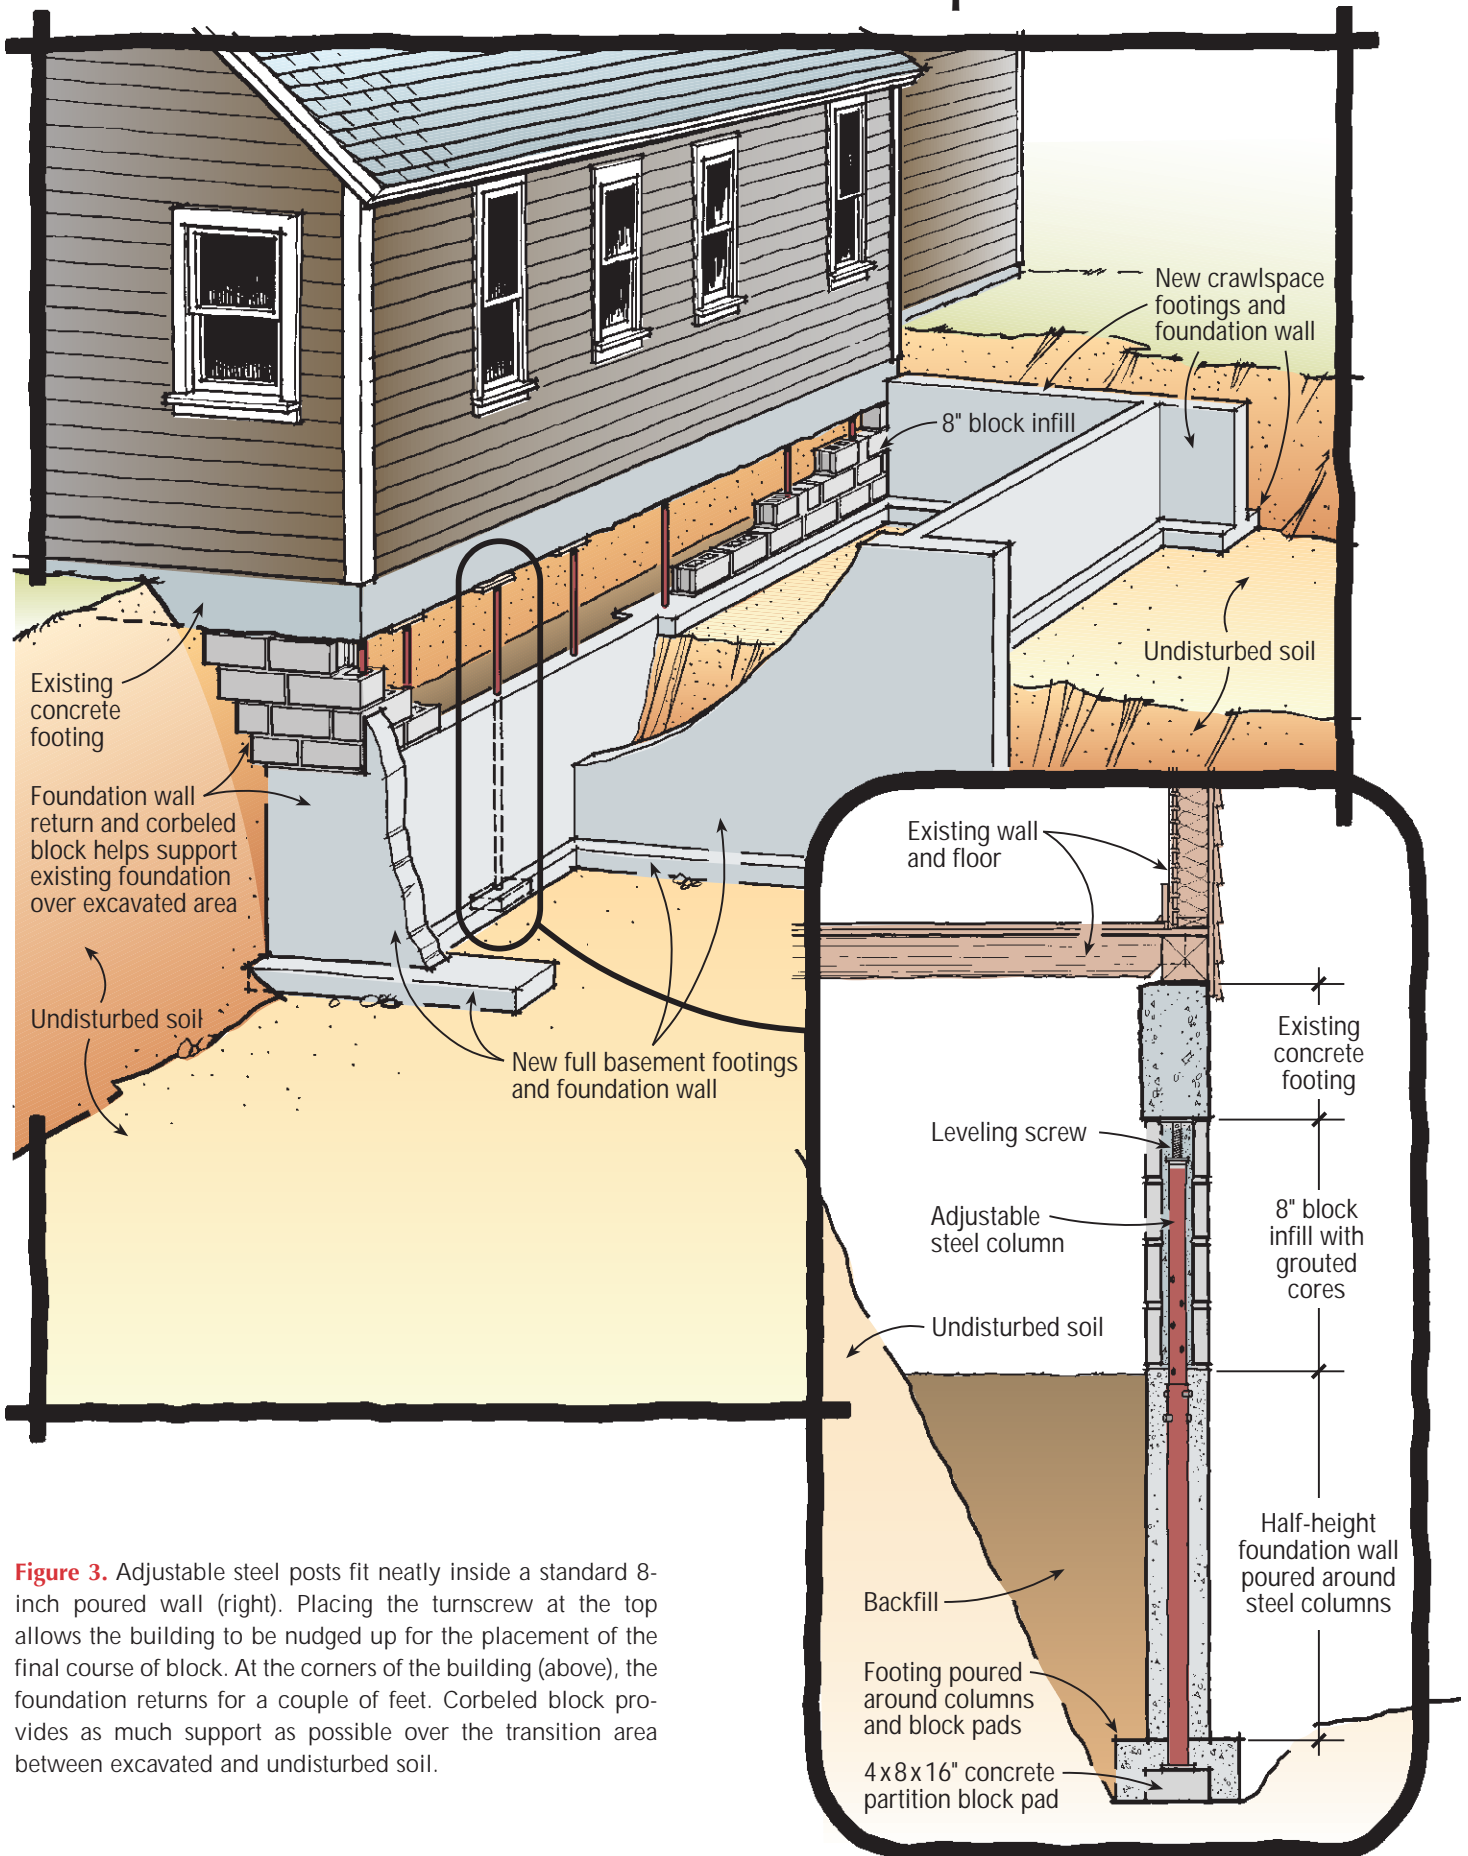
Adjustable steel posts fit neatly inside a standard 8-inch poured wall (right). Placing the turnscrow at the top allows the building to be nudged up for the placement of the final course of block. At the corners of the building (above), the foundation returns for a couple of feet. Corbeled block provides as much support as possible over the transition area between excavated and undisturbed soil.
